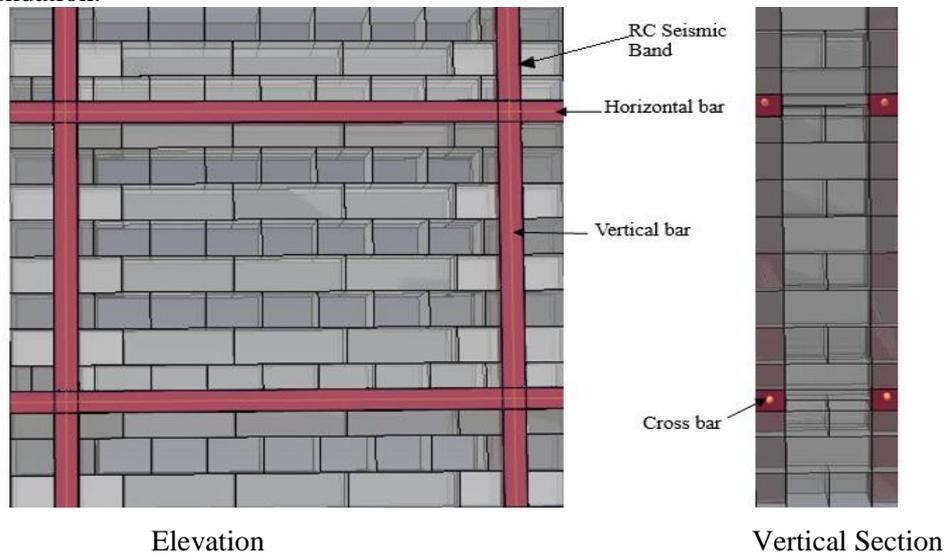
Schematic diagram showing the main components of semi-confined masonry wall
